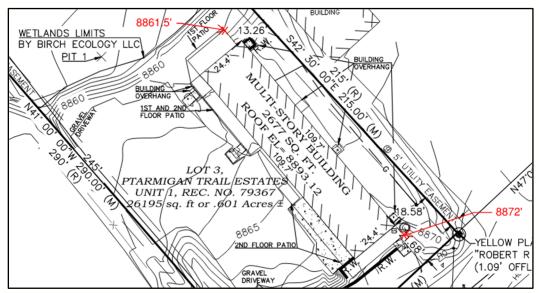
High and Low Building Foundation Elevations (Source: N/V/5 ALATA 04/18/2023)
